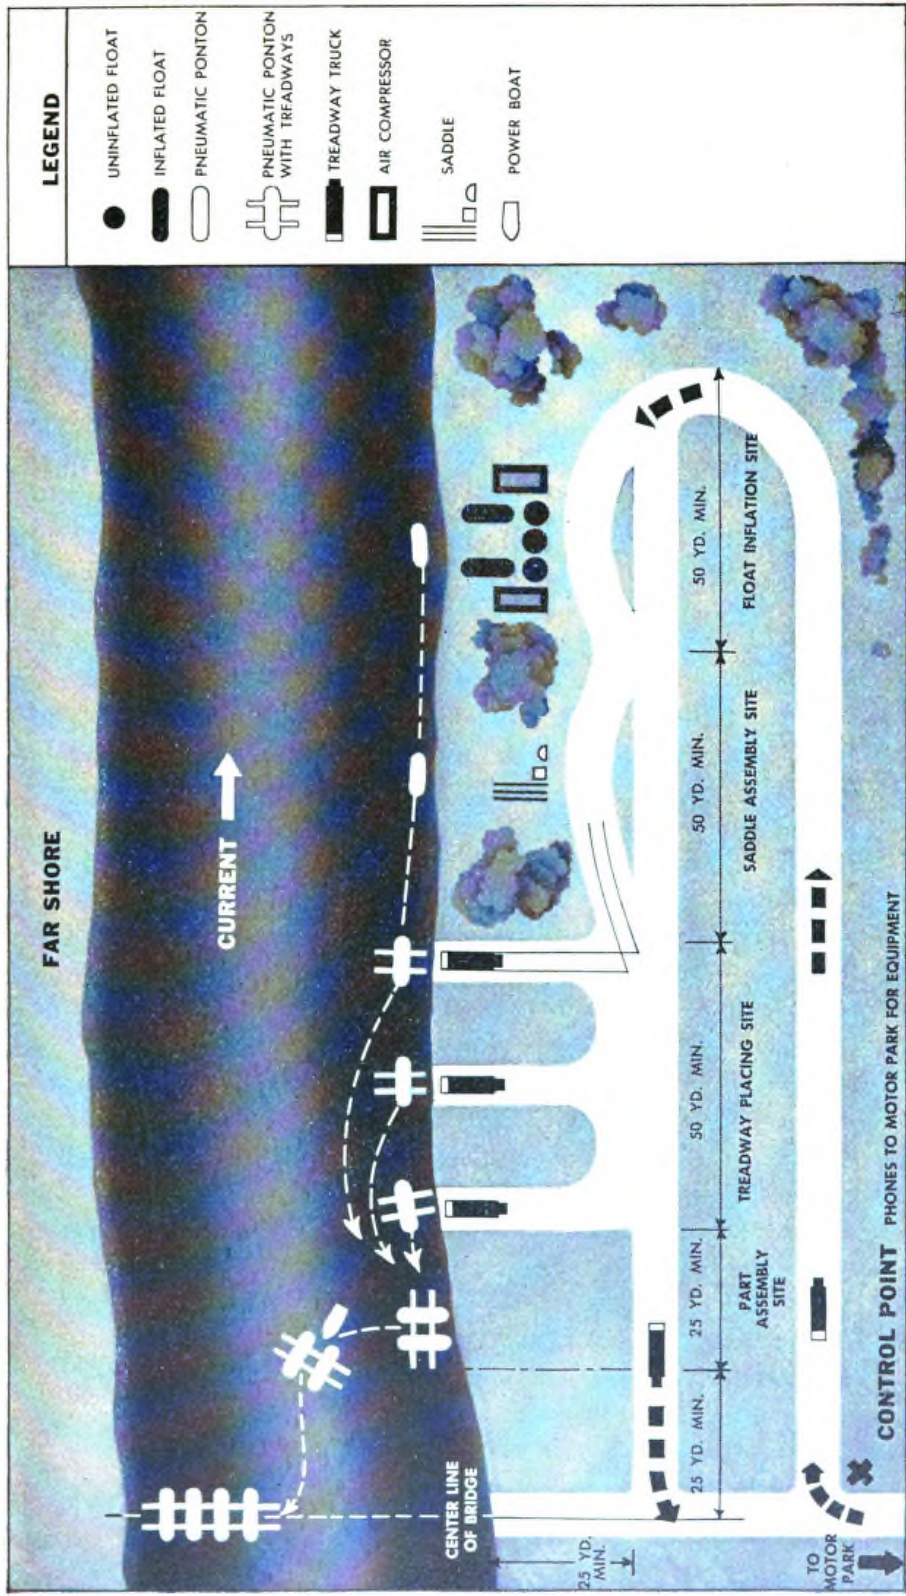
Site lay-out for bridge construction by parts from far shore to near shore, using one assembly site.
